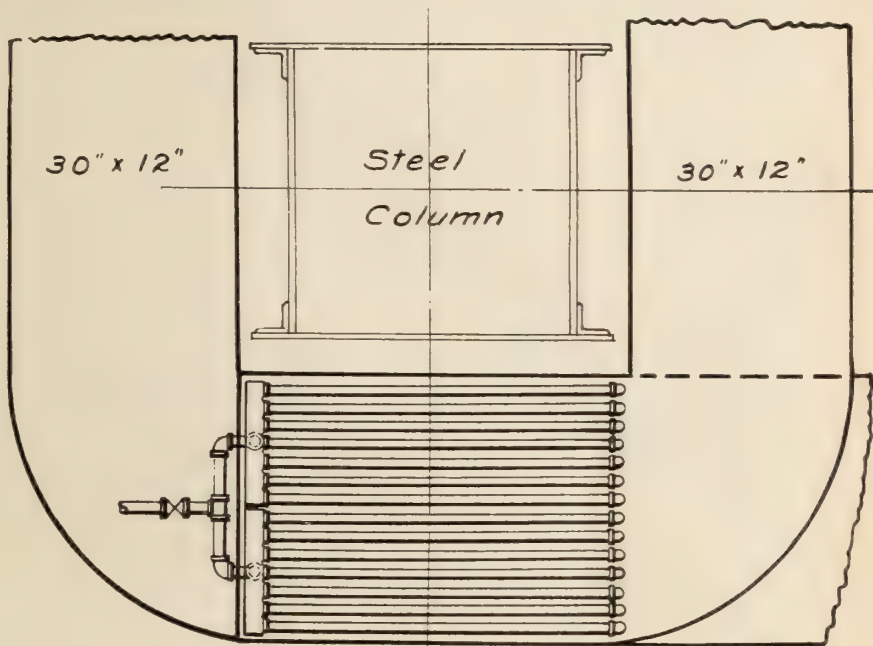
TYPICAL PLAN VIEW OF TERTIARY COILS.
